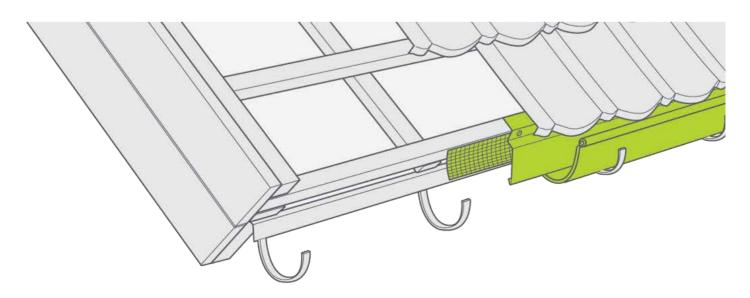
EAVES DETAIL WITH ANTICODENSATION FLASHING, BIRD PROTECTION GRID AND EAVES FLASHING
